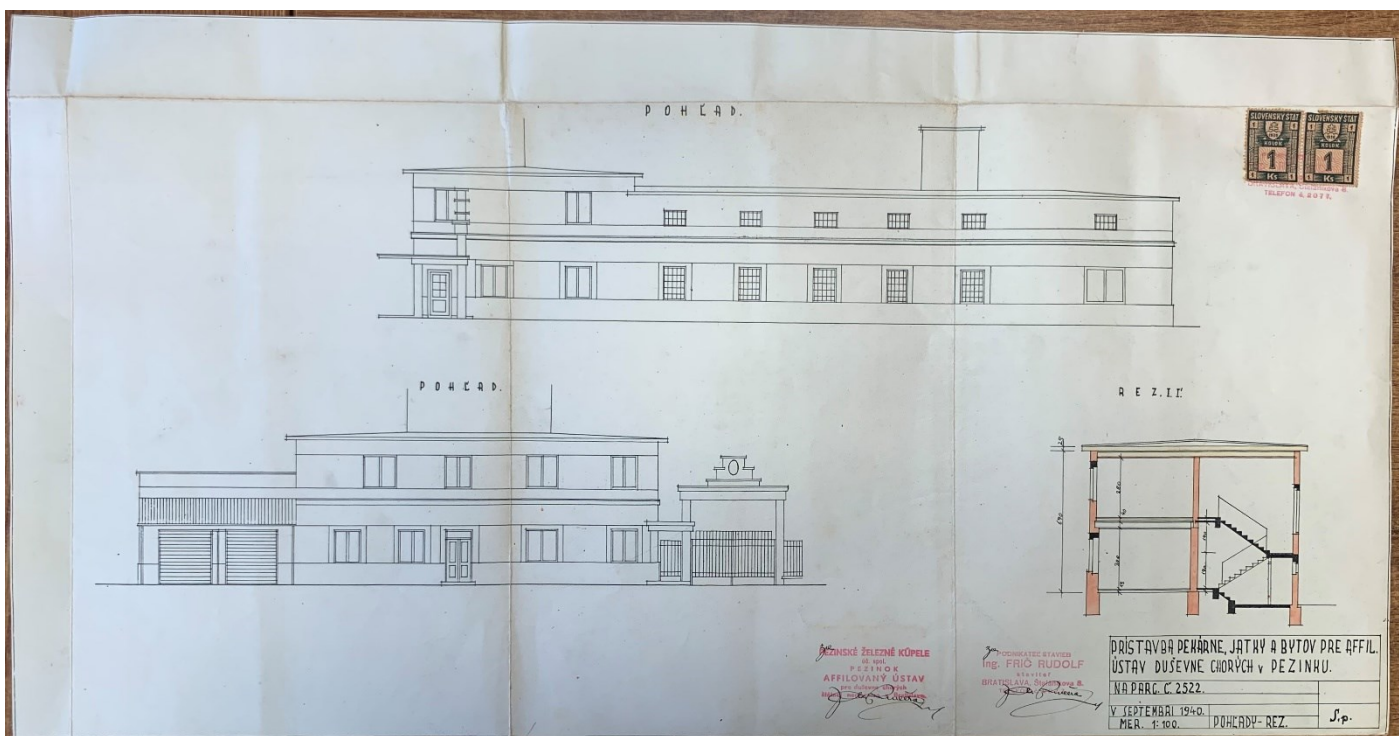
The Pezinok Institute for People with Nervous and Mental Health Disorders. Administration and entrance building. Elevations and cross-section. (Source: State Archives in Bratislava, Slovakia, 1940)
